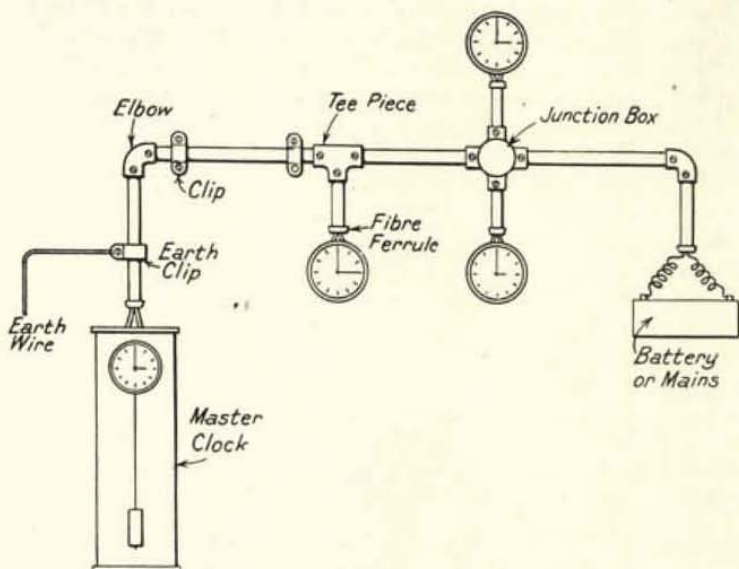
CLOCK INSTALLATION WIRED IN CONDUIT
